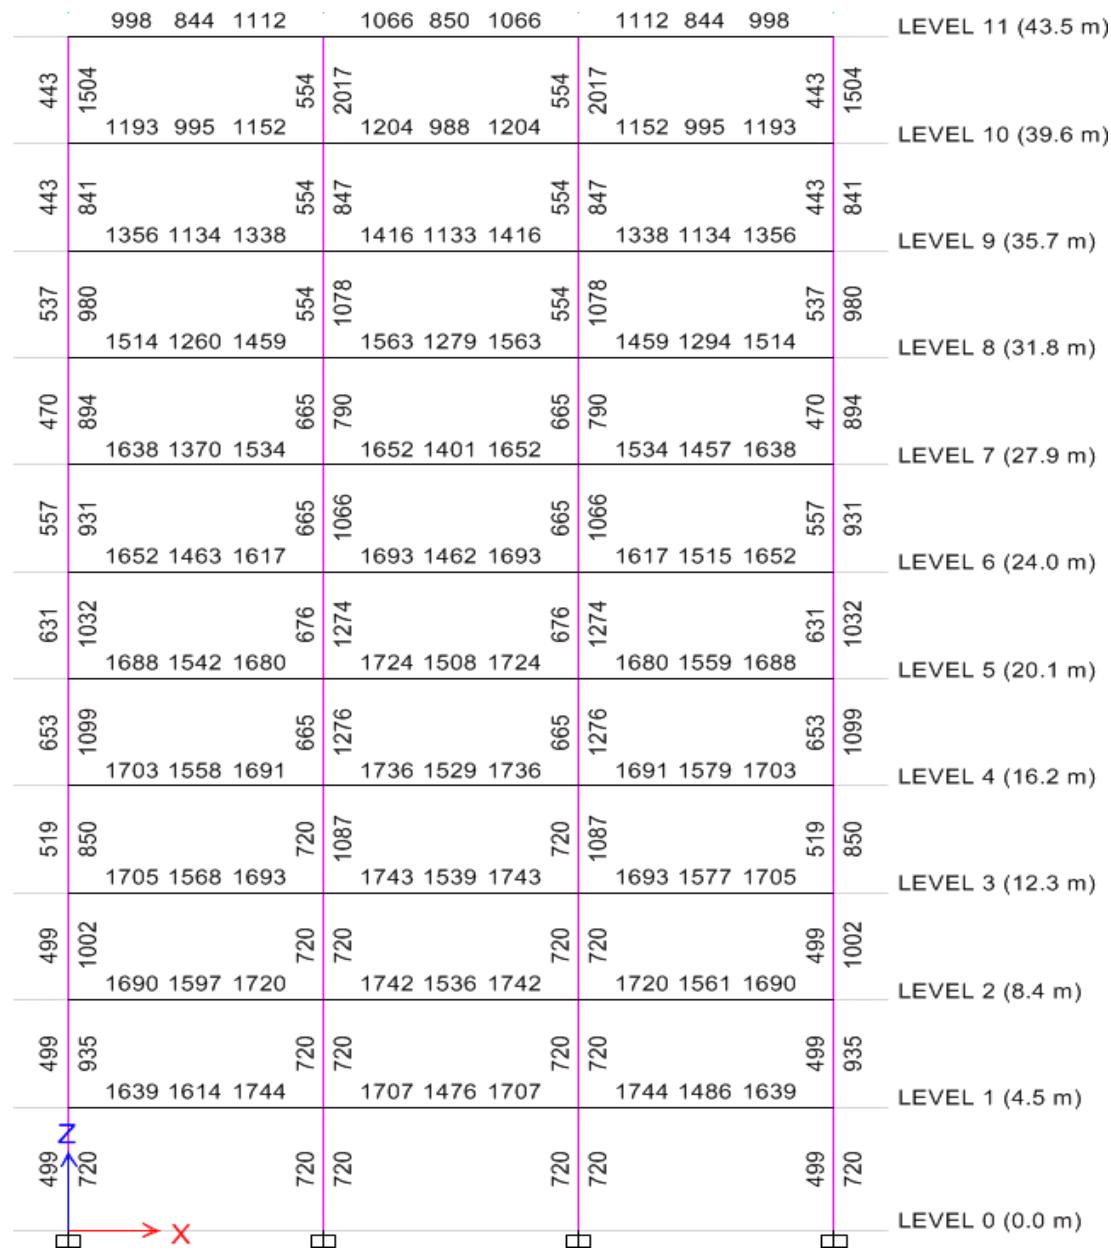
Required longitudinal reinforcement for building ID 2463
